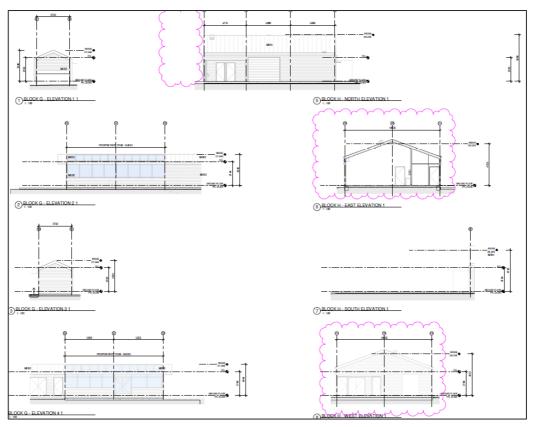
| Block G and H elevations (Source: Applicant's RtS 2021)
